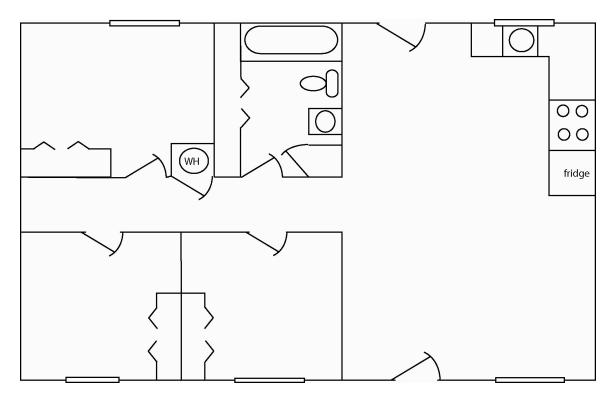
Floor plan of single-unit dwelling (not to scale).
